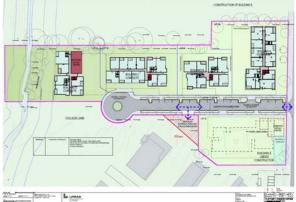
Subdivision of residual development lot into Lots 20, 21, 22 and road lot 23.
